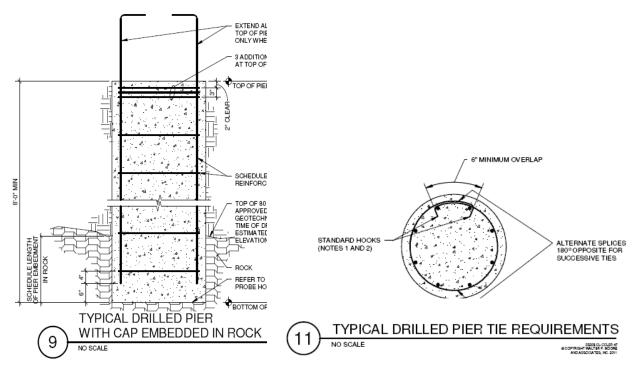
| Typical Drilled Pier Details (Courtesy of Walter P. Moore)
